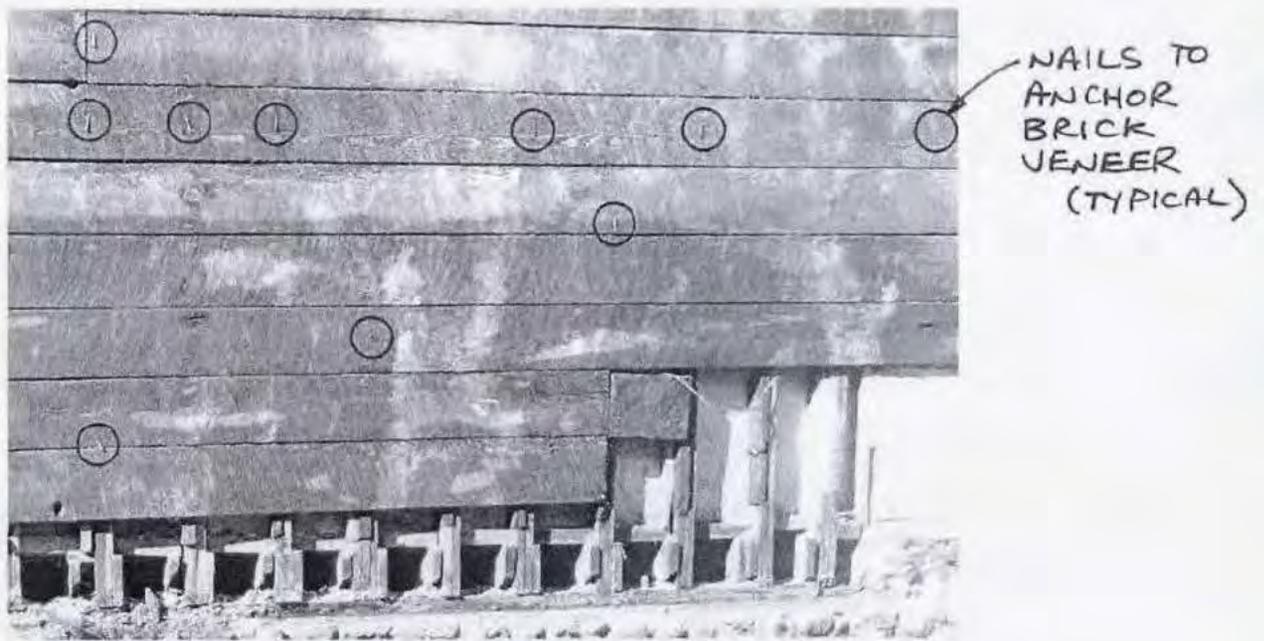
Nails for Anchoring Brick Veneer to East Wall of 439 Powell Street, Vancouver
